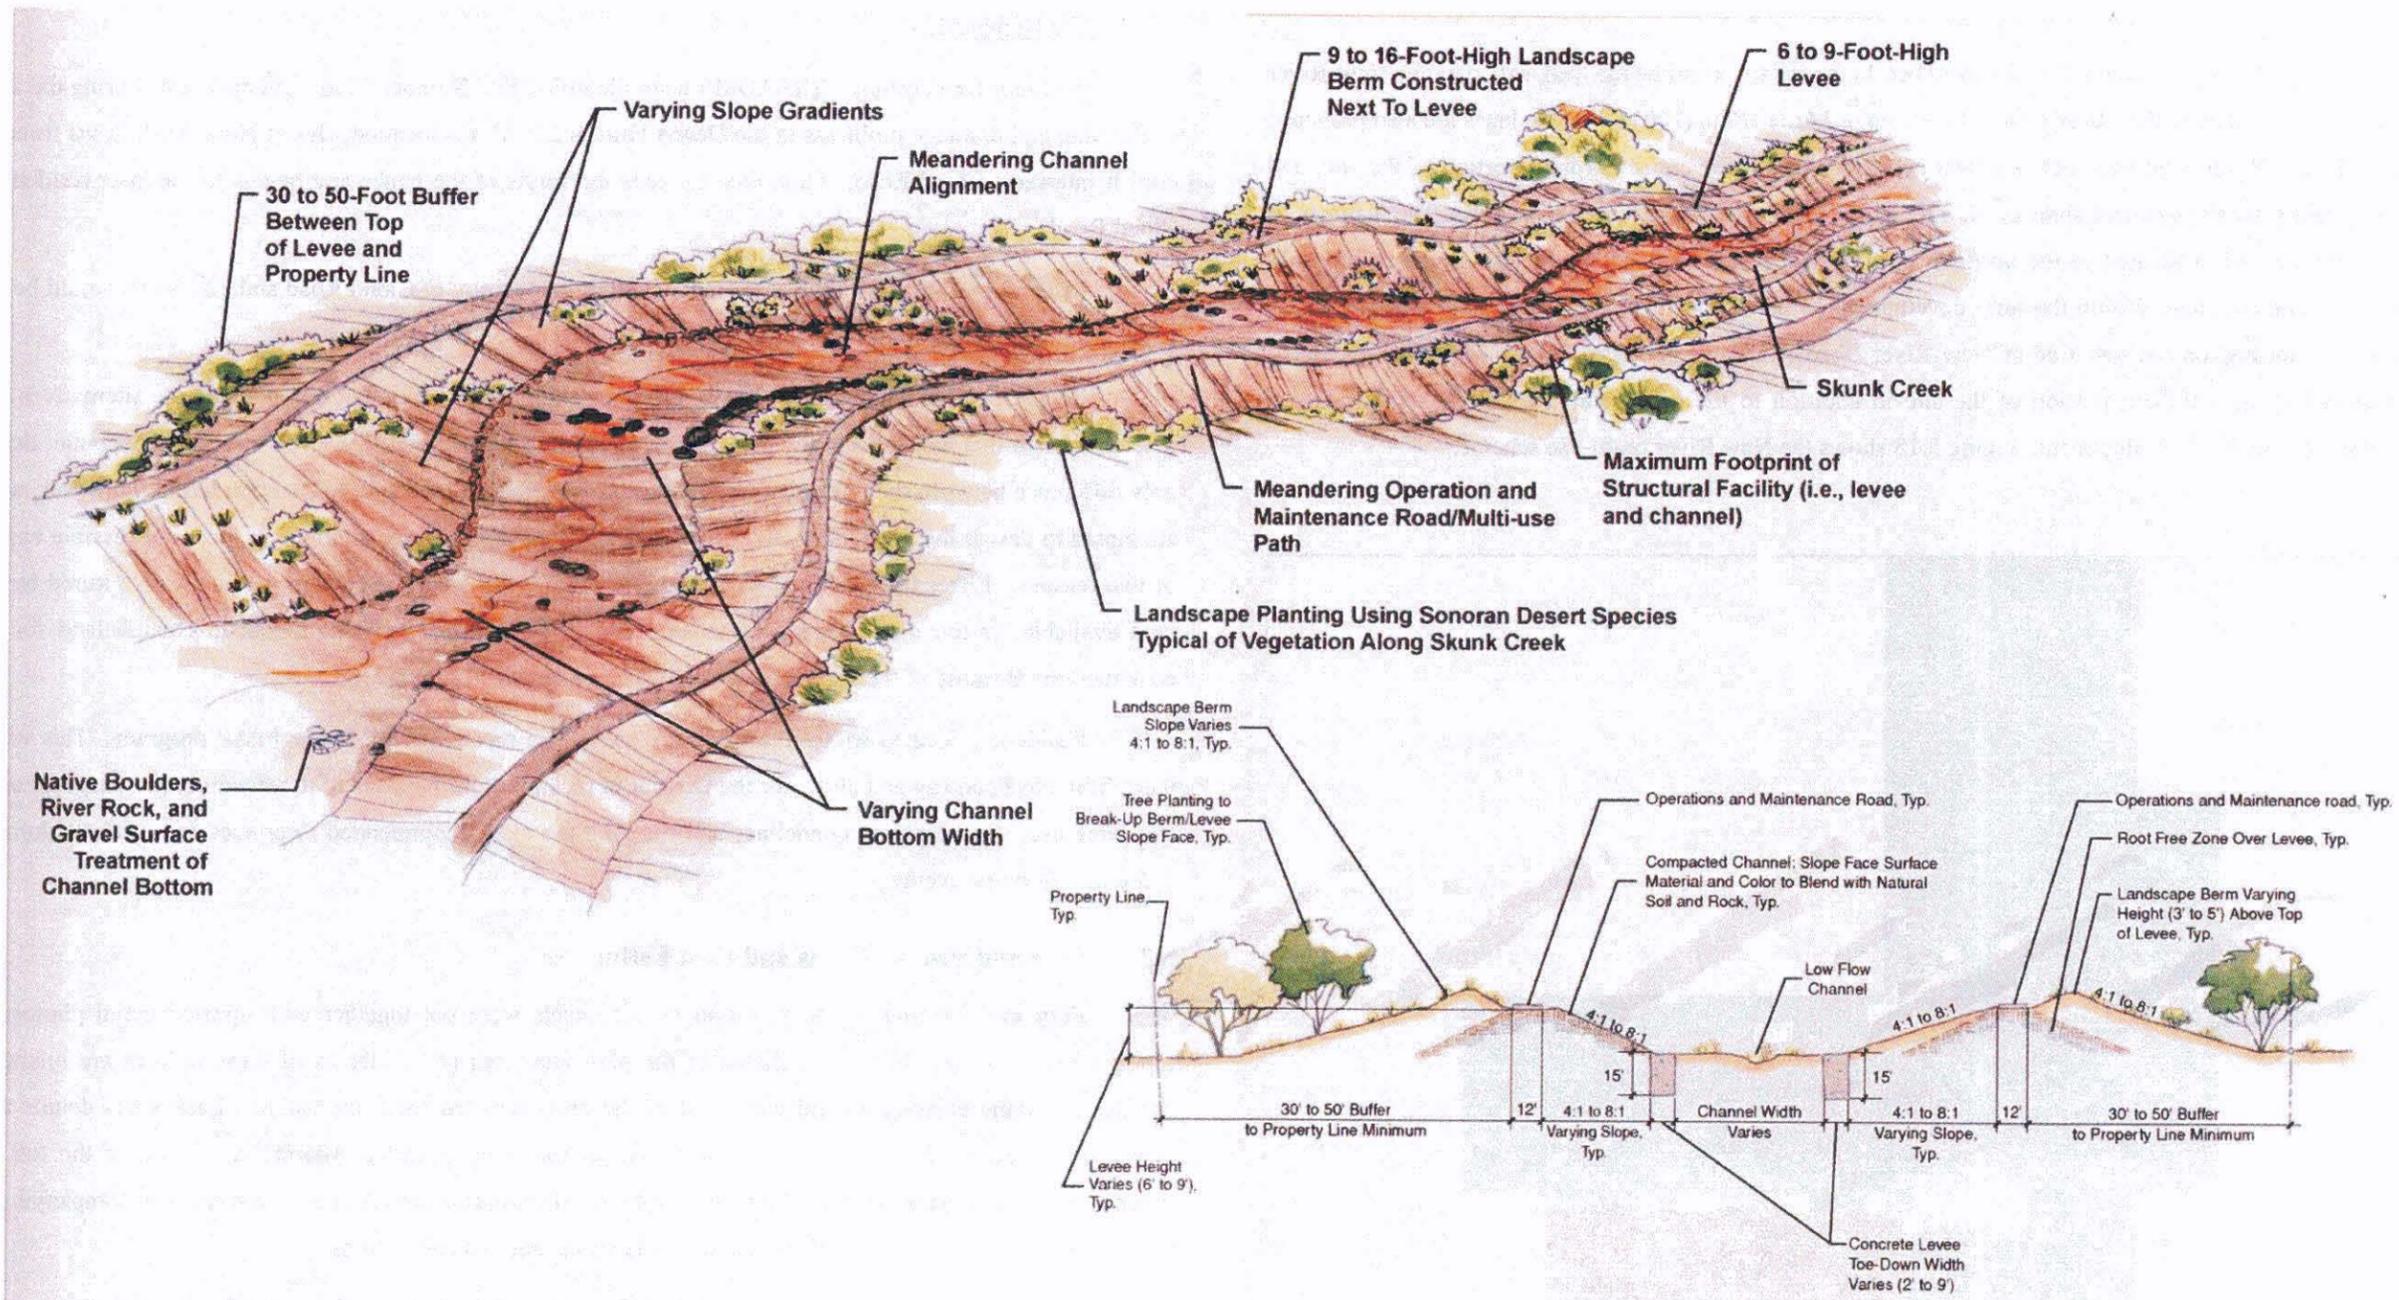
Recommended Alternative – New River Road Bridge Levees Aesthetic Treatments Section and Sketch
